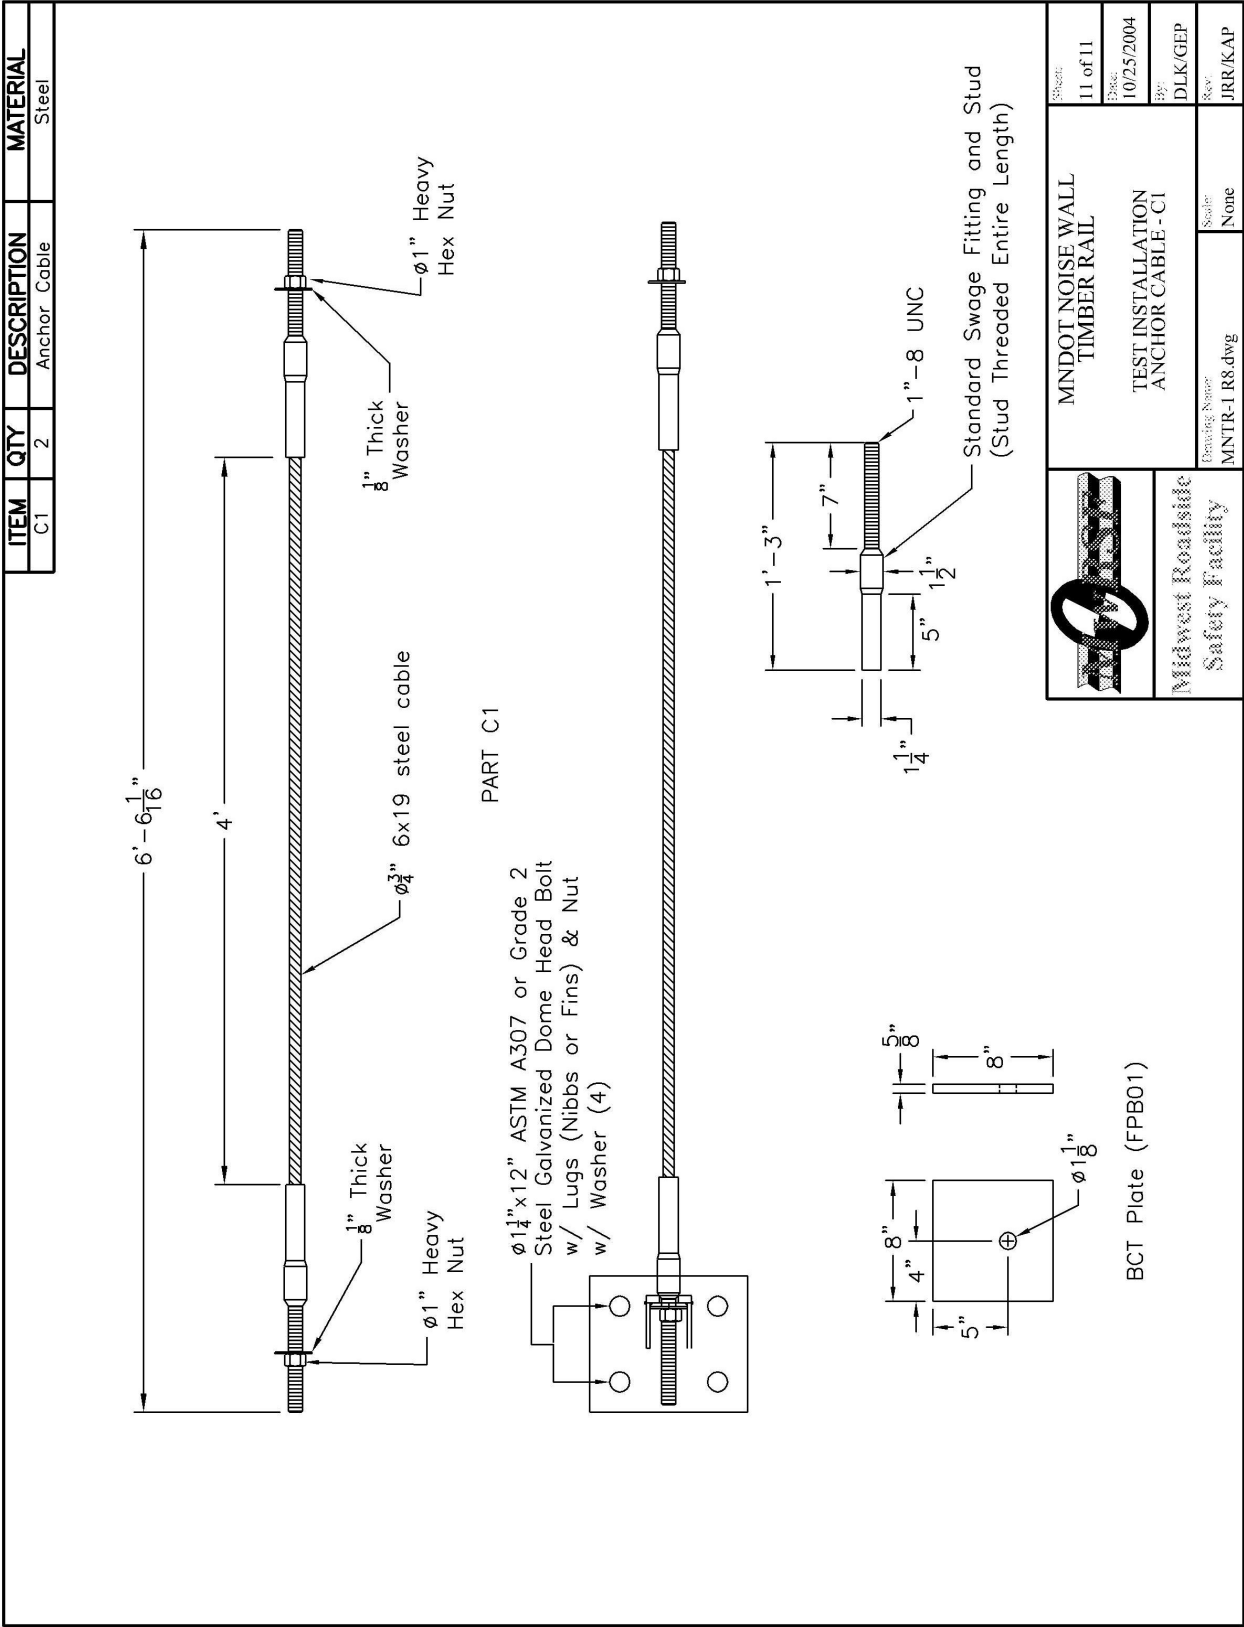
Mn/DOT's Timber Rub Rail Design Anchor Cable Details (English)
